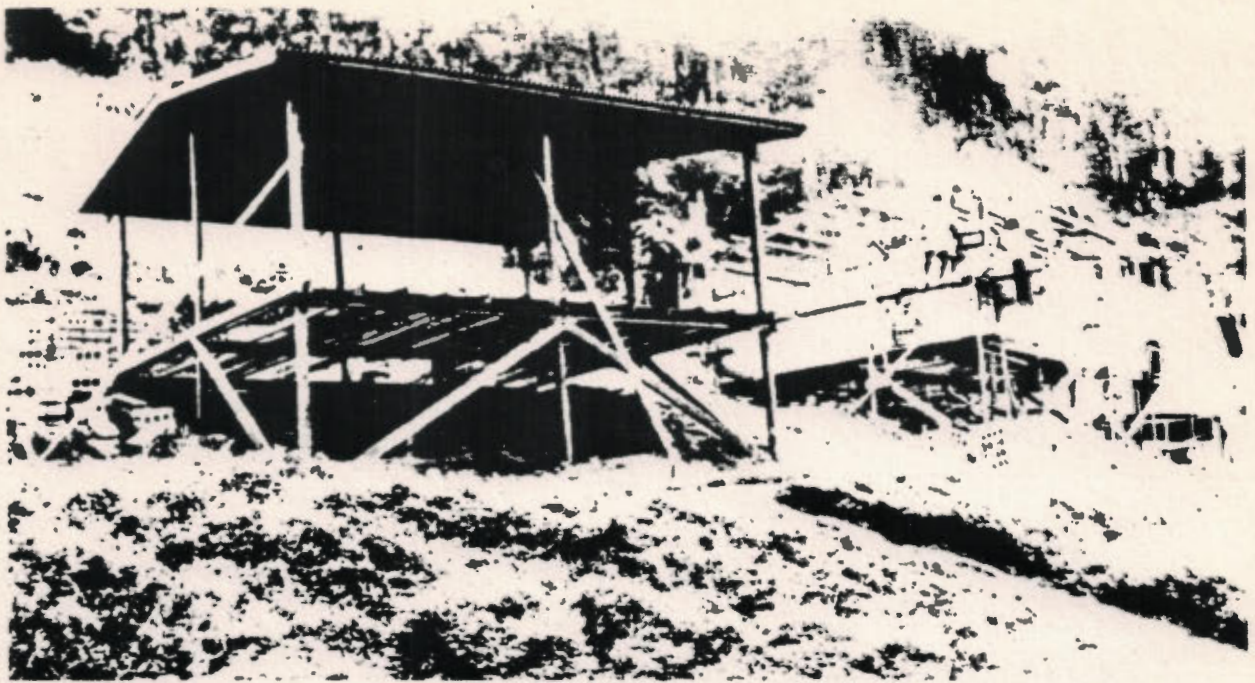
Part of an estate of houses being built in St Vincent using the author's designs
